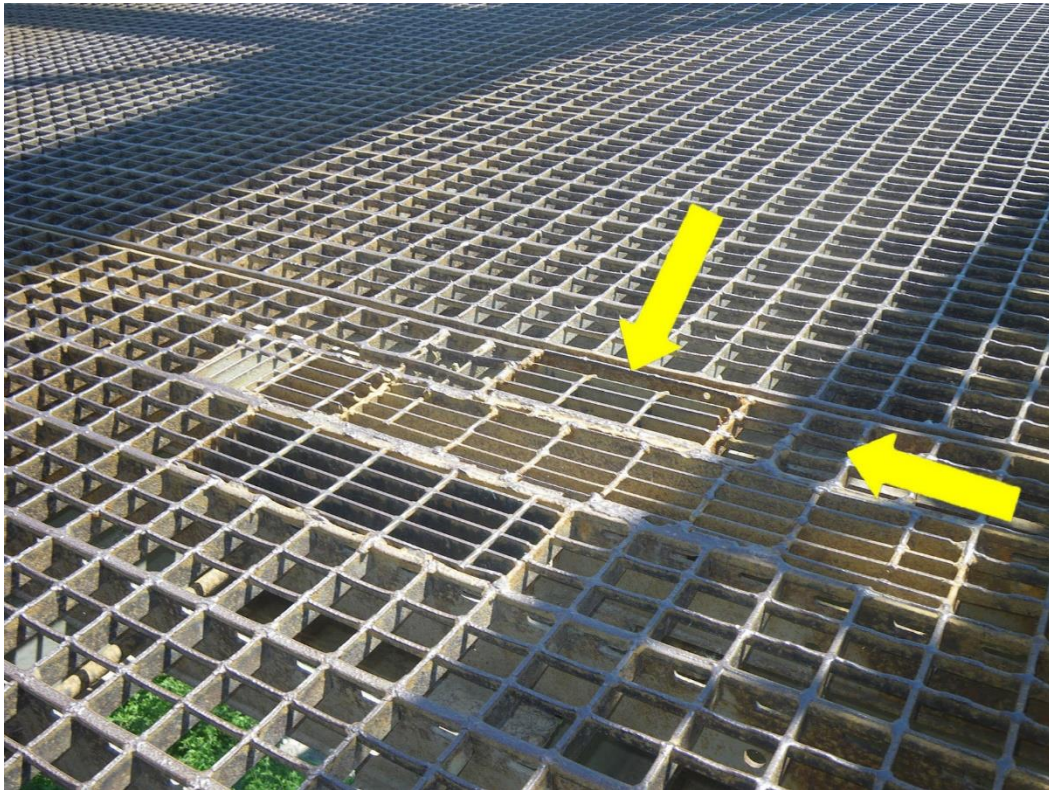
Deck between Stringers S6 and S9 at Floorbeam FB5N, Span 1, Looking Southeast - Repair with missing longitudinal distribution bars. Note cracked transverse welds between the grid deck and floorbeam top flange.
